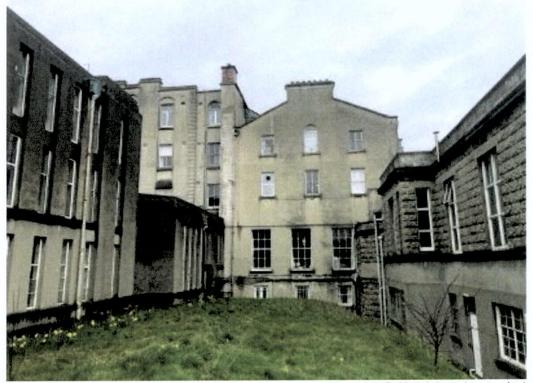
View on south-west elevation of MPH, positioned between the Archive (left) and the Finlay wing (right).
